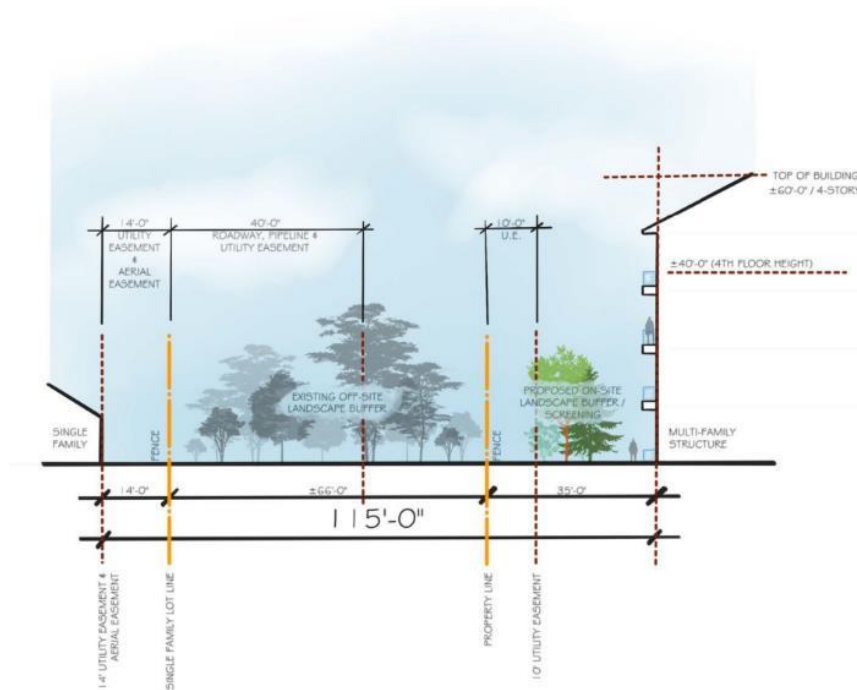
Exhibit B / Section B illustrates the northwest boundary parallel to FM2978 abutting the single-family project accounting all the easements, landscape setbacks, parking layout and boundary location to show a worst-case scenario of the building's proximities.
